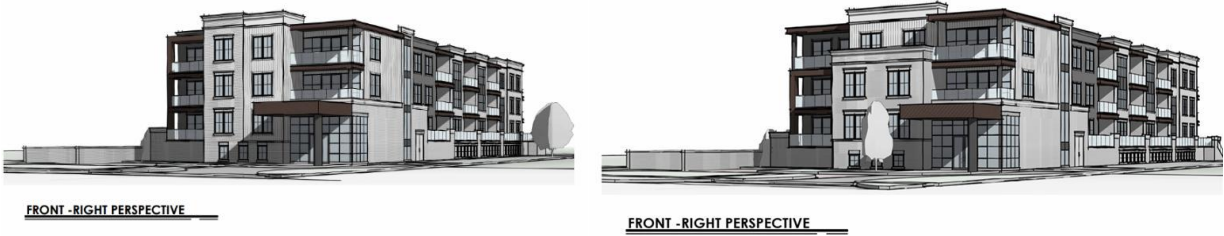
Stepback at the 3rd floor is proposed in the front elevation (right picture) whereas the previous design (left picture) does not incorporate stepback.
